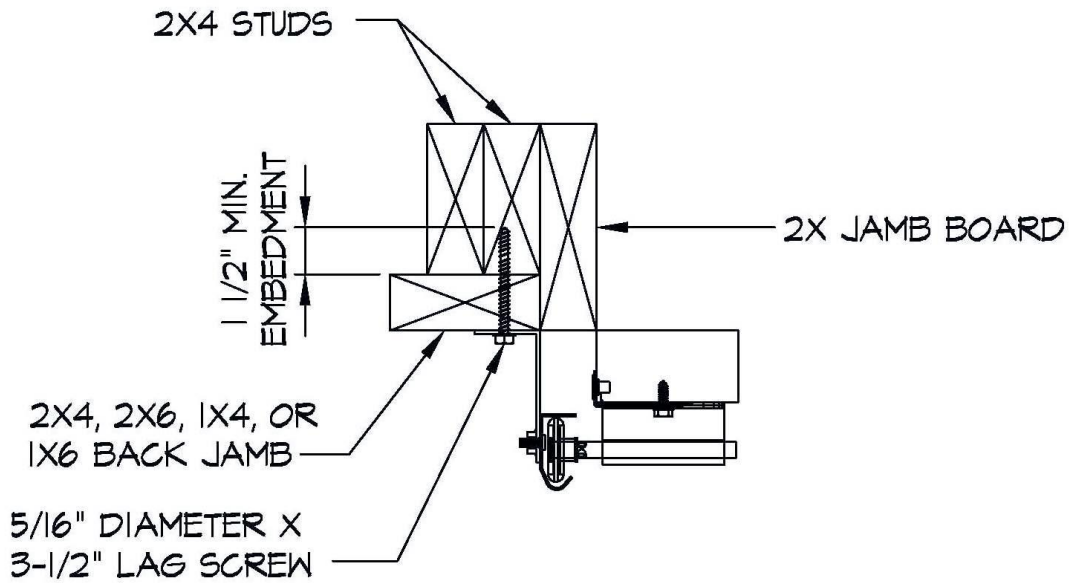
Attachment of garage door brackets directly to structure through wood jamb (Option 3)
